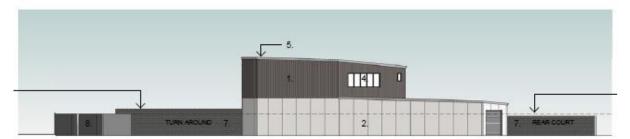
North elevation of proposed maintenance workshop and staff rooms.
